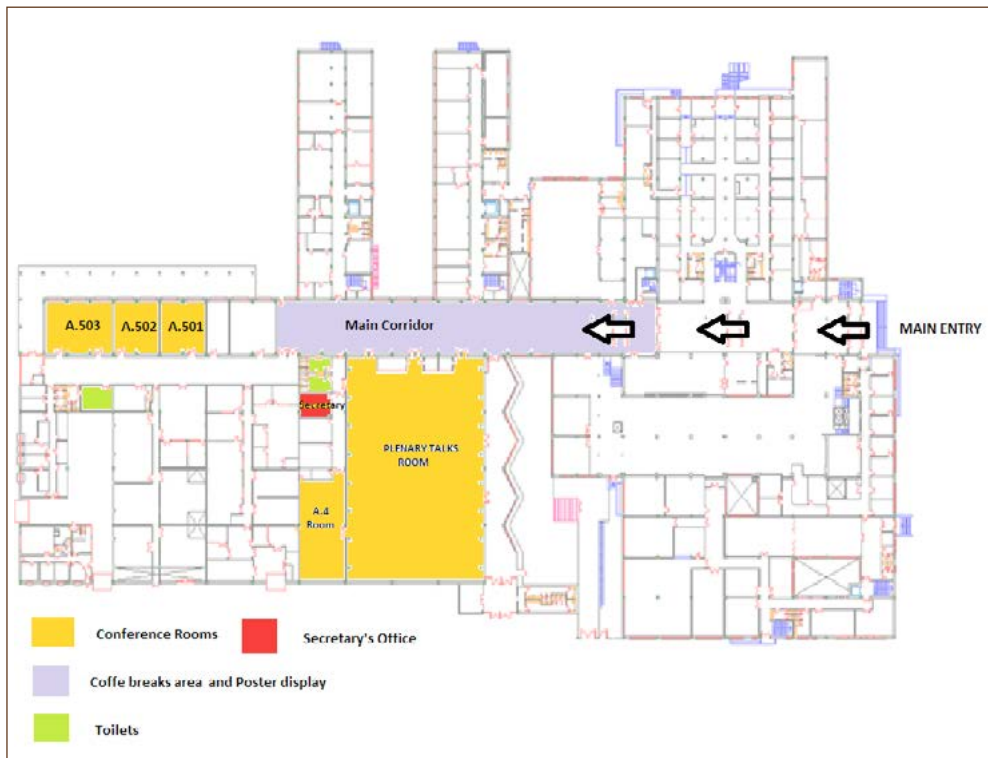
Ground floor plane of El Sario building. Conference rooms.
